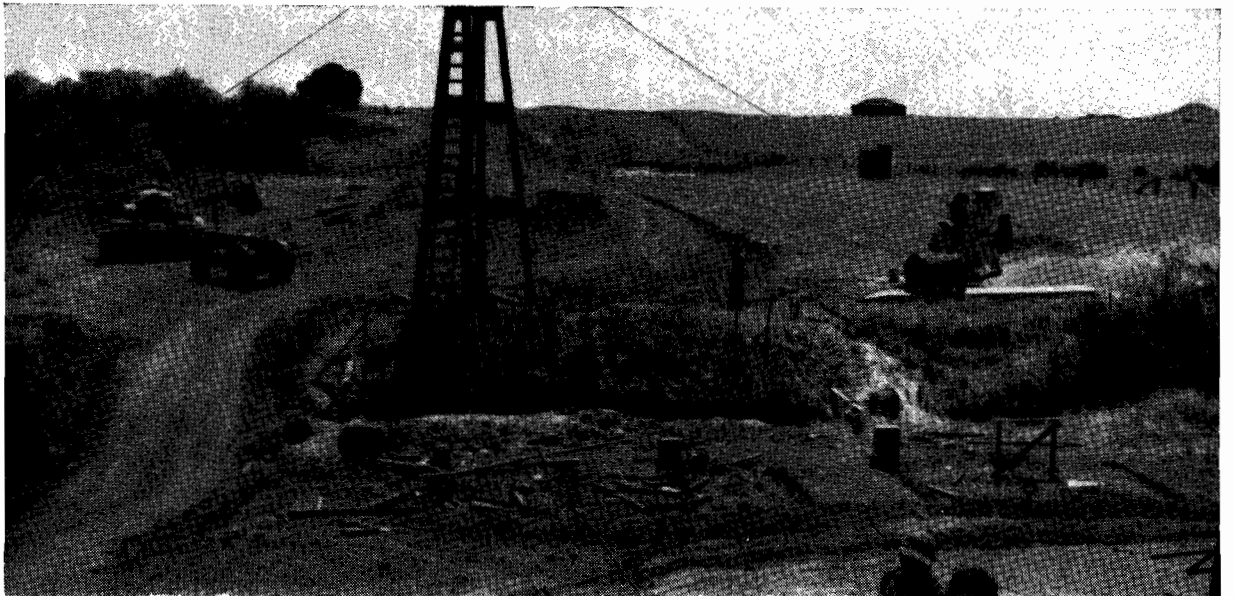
Realignment and reconstruction of North-Western Highway approx. 7 miles north of Ballarat.
